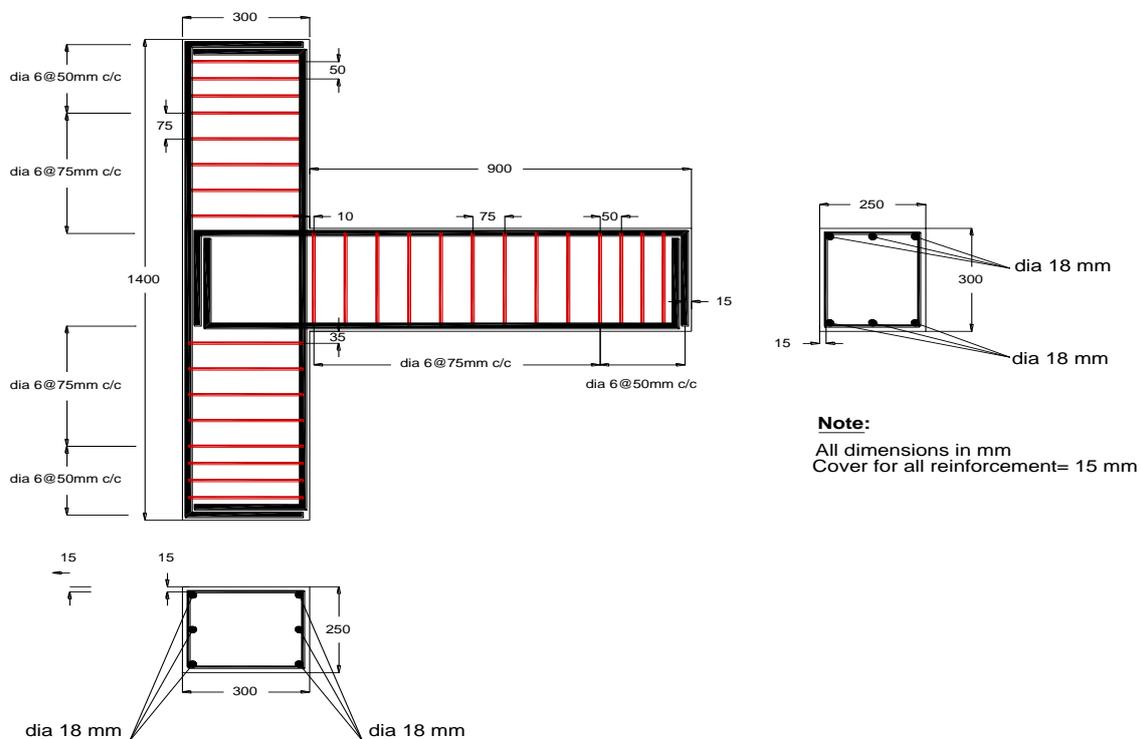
Geometric and reinforcement details for BCJ-18 MM
